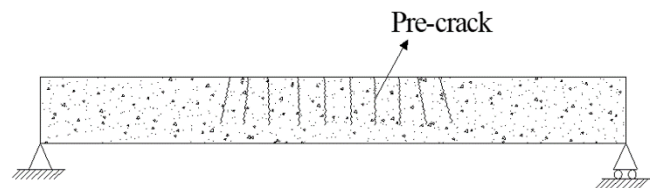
Pre-cracked reinforced concrete beam.
